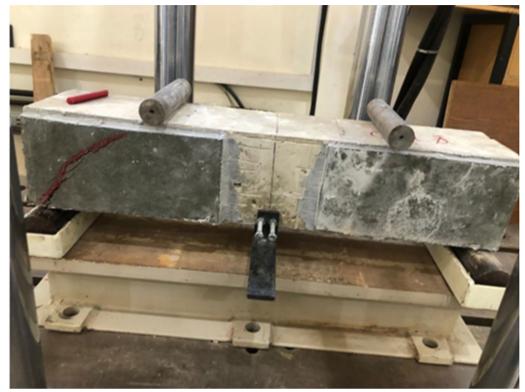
RC beam without stirrups strengthened with HPFRC plates
